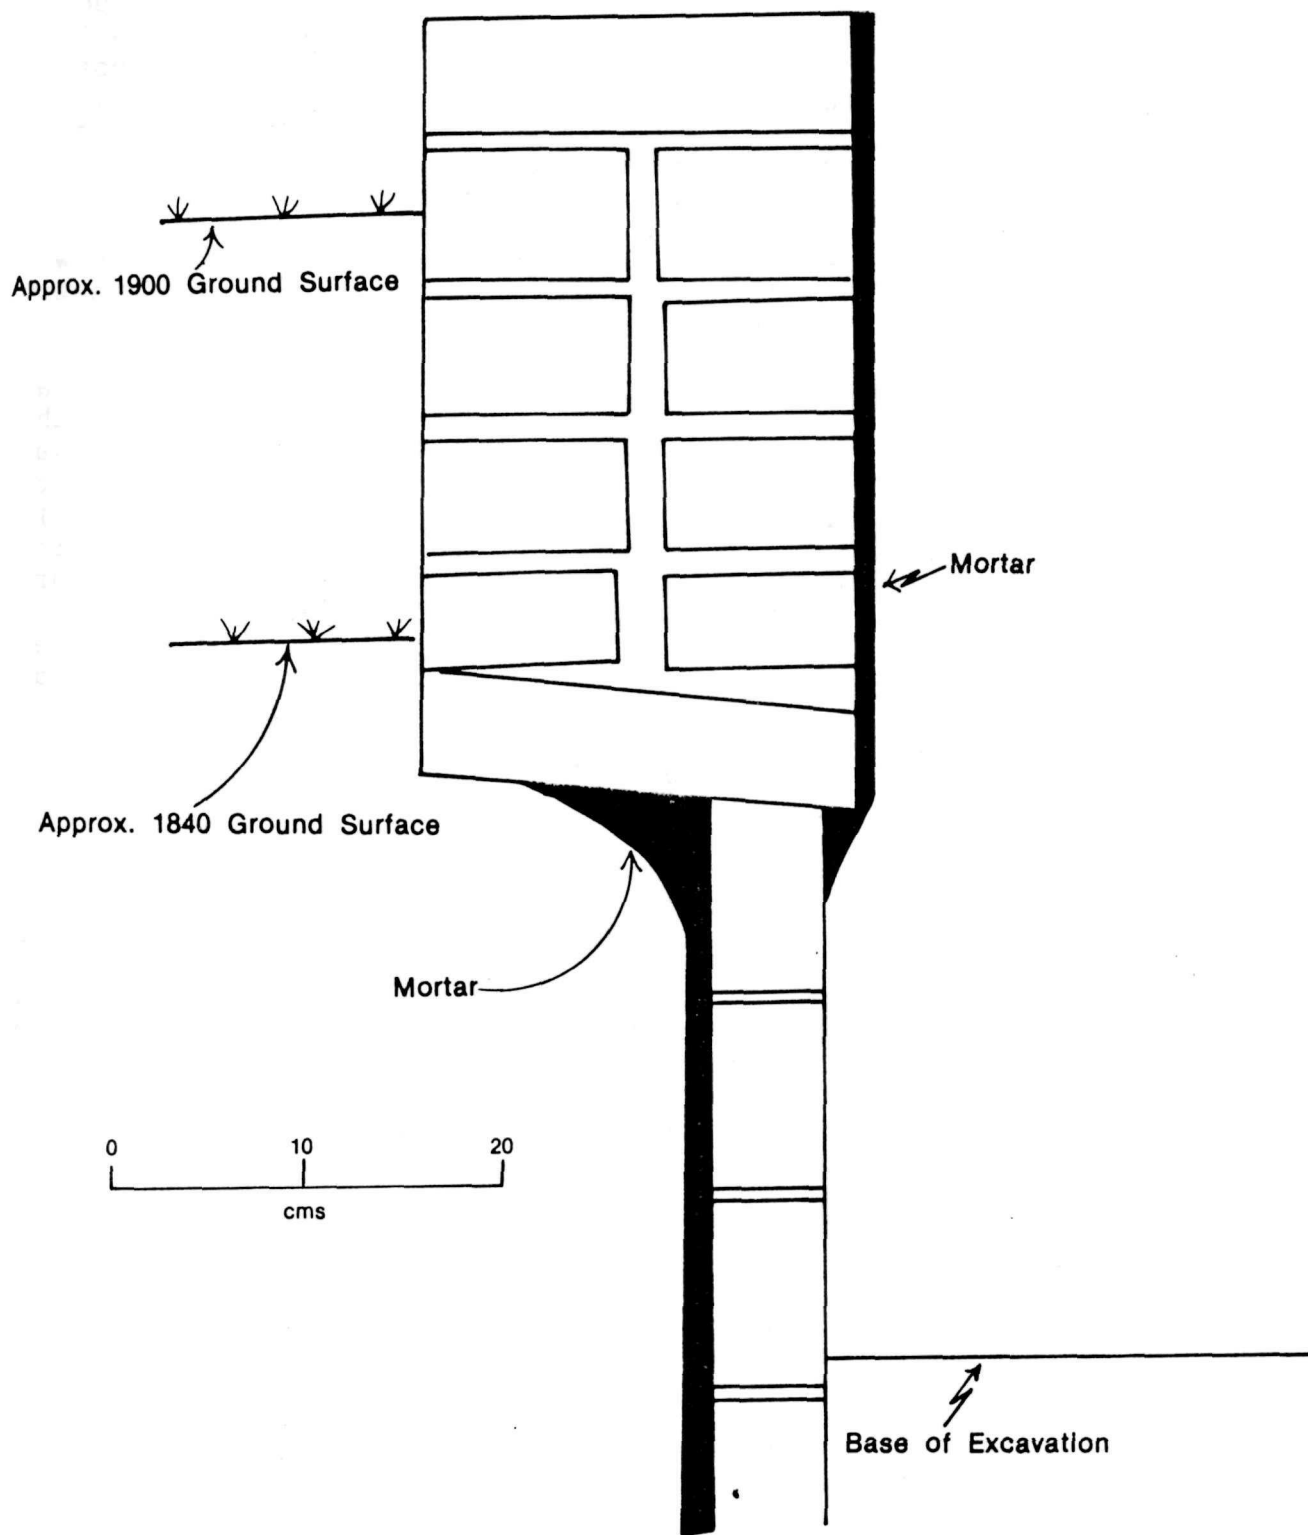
The Cook Site, Test 7, Detail of Cistern Construction.
